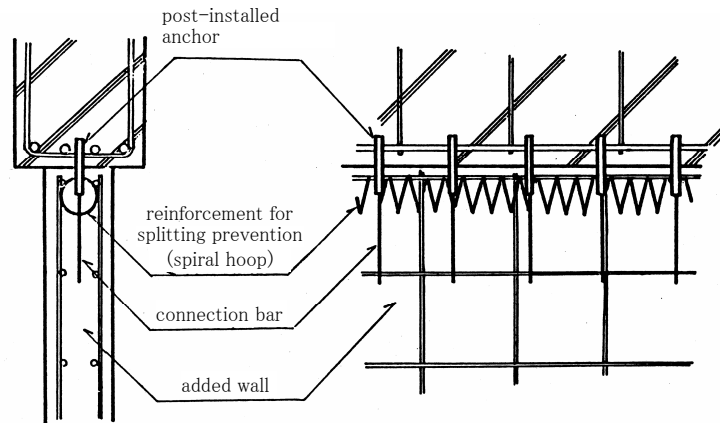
Spiral hoop reinforcement against splitting failure
